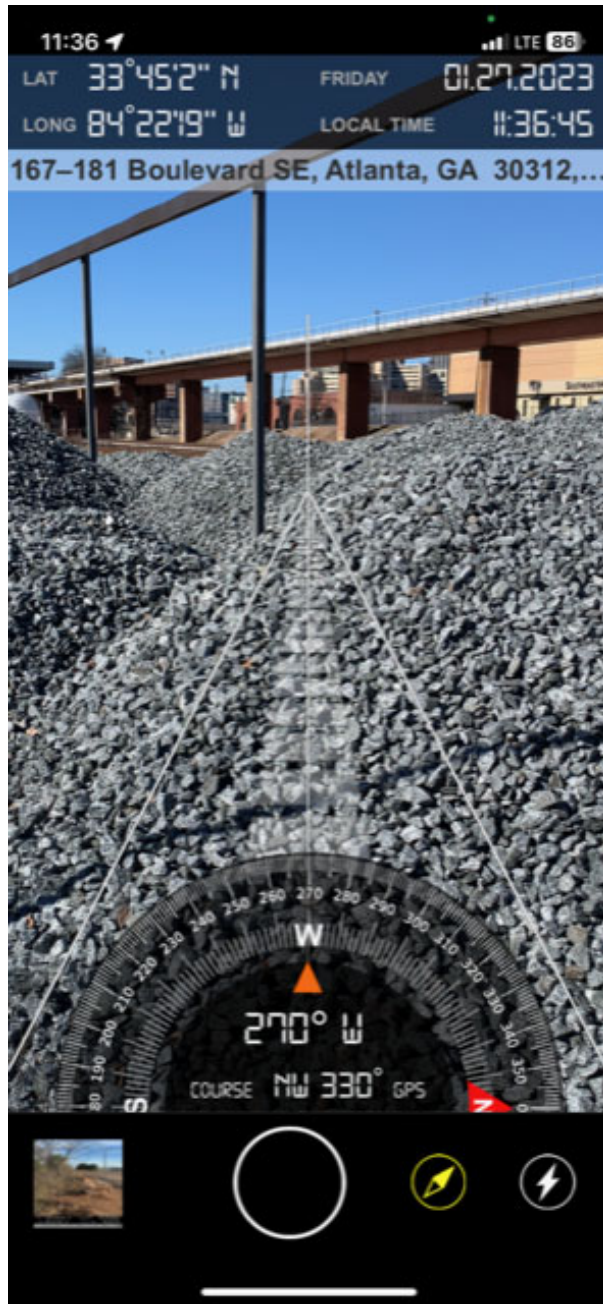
Location of the proposed Hulsey Yard RPTR Tower, view west.
